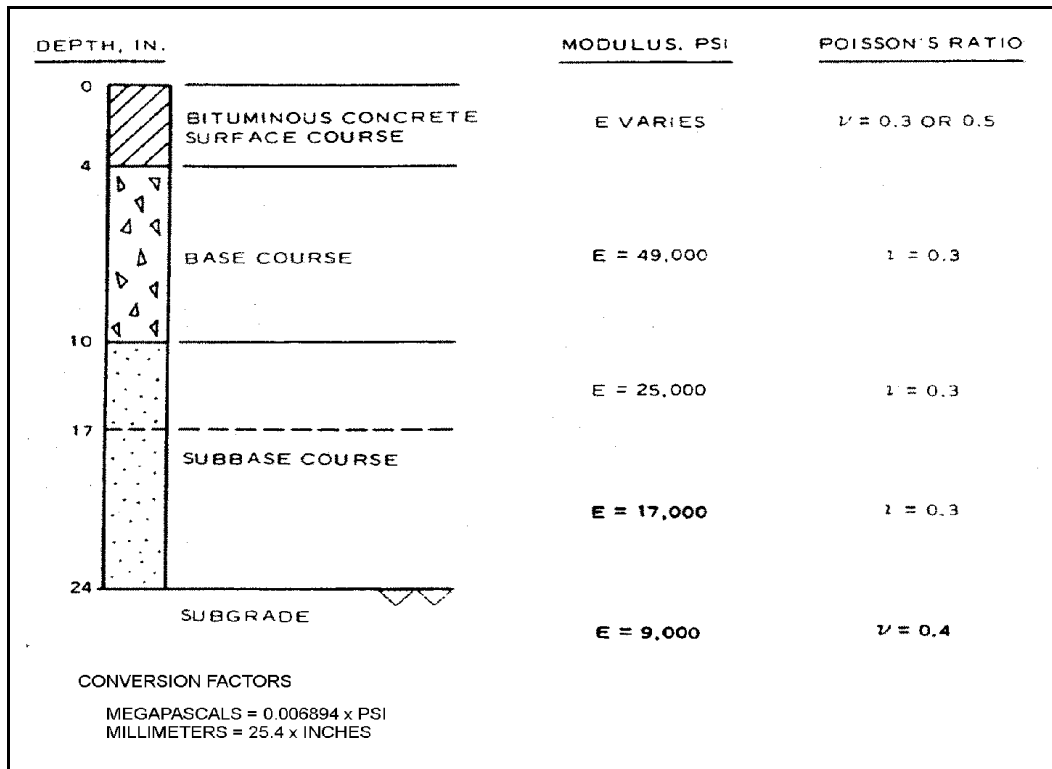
Section for pavement thickness of 610 millimeters (24 inches) for initial runway design
